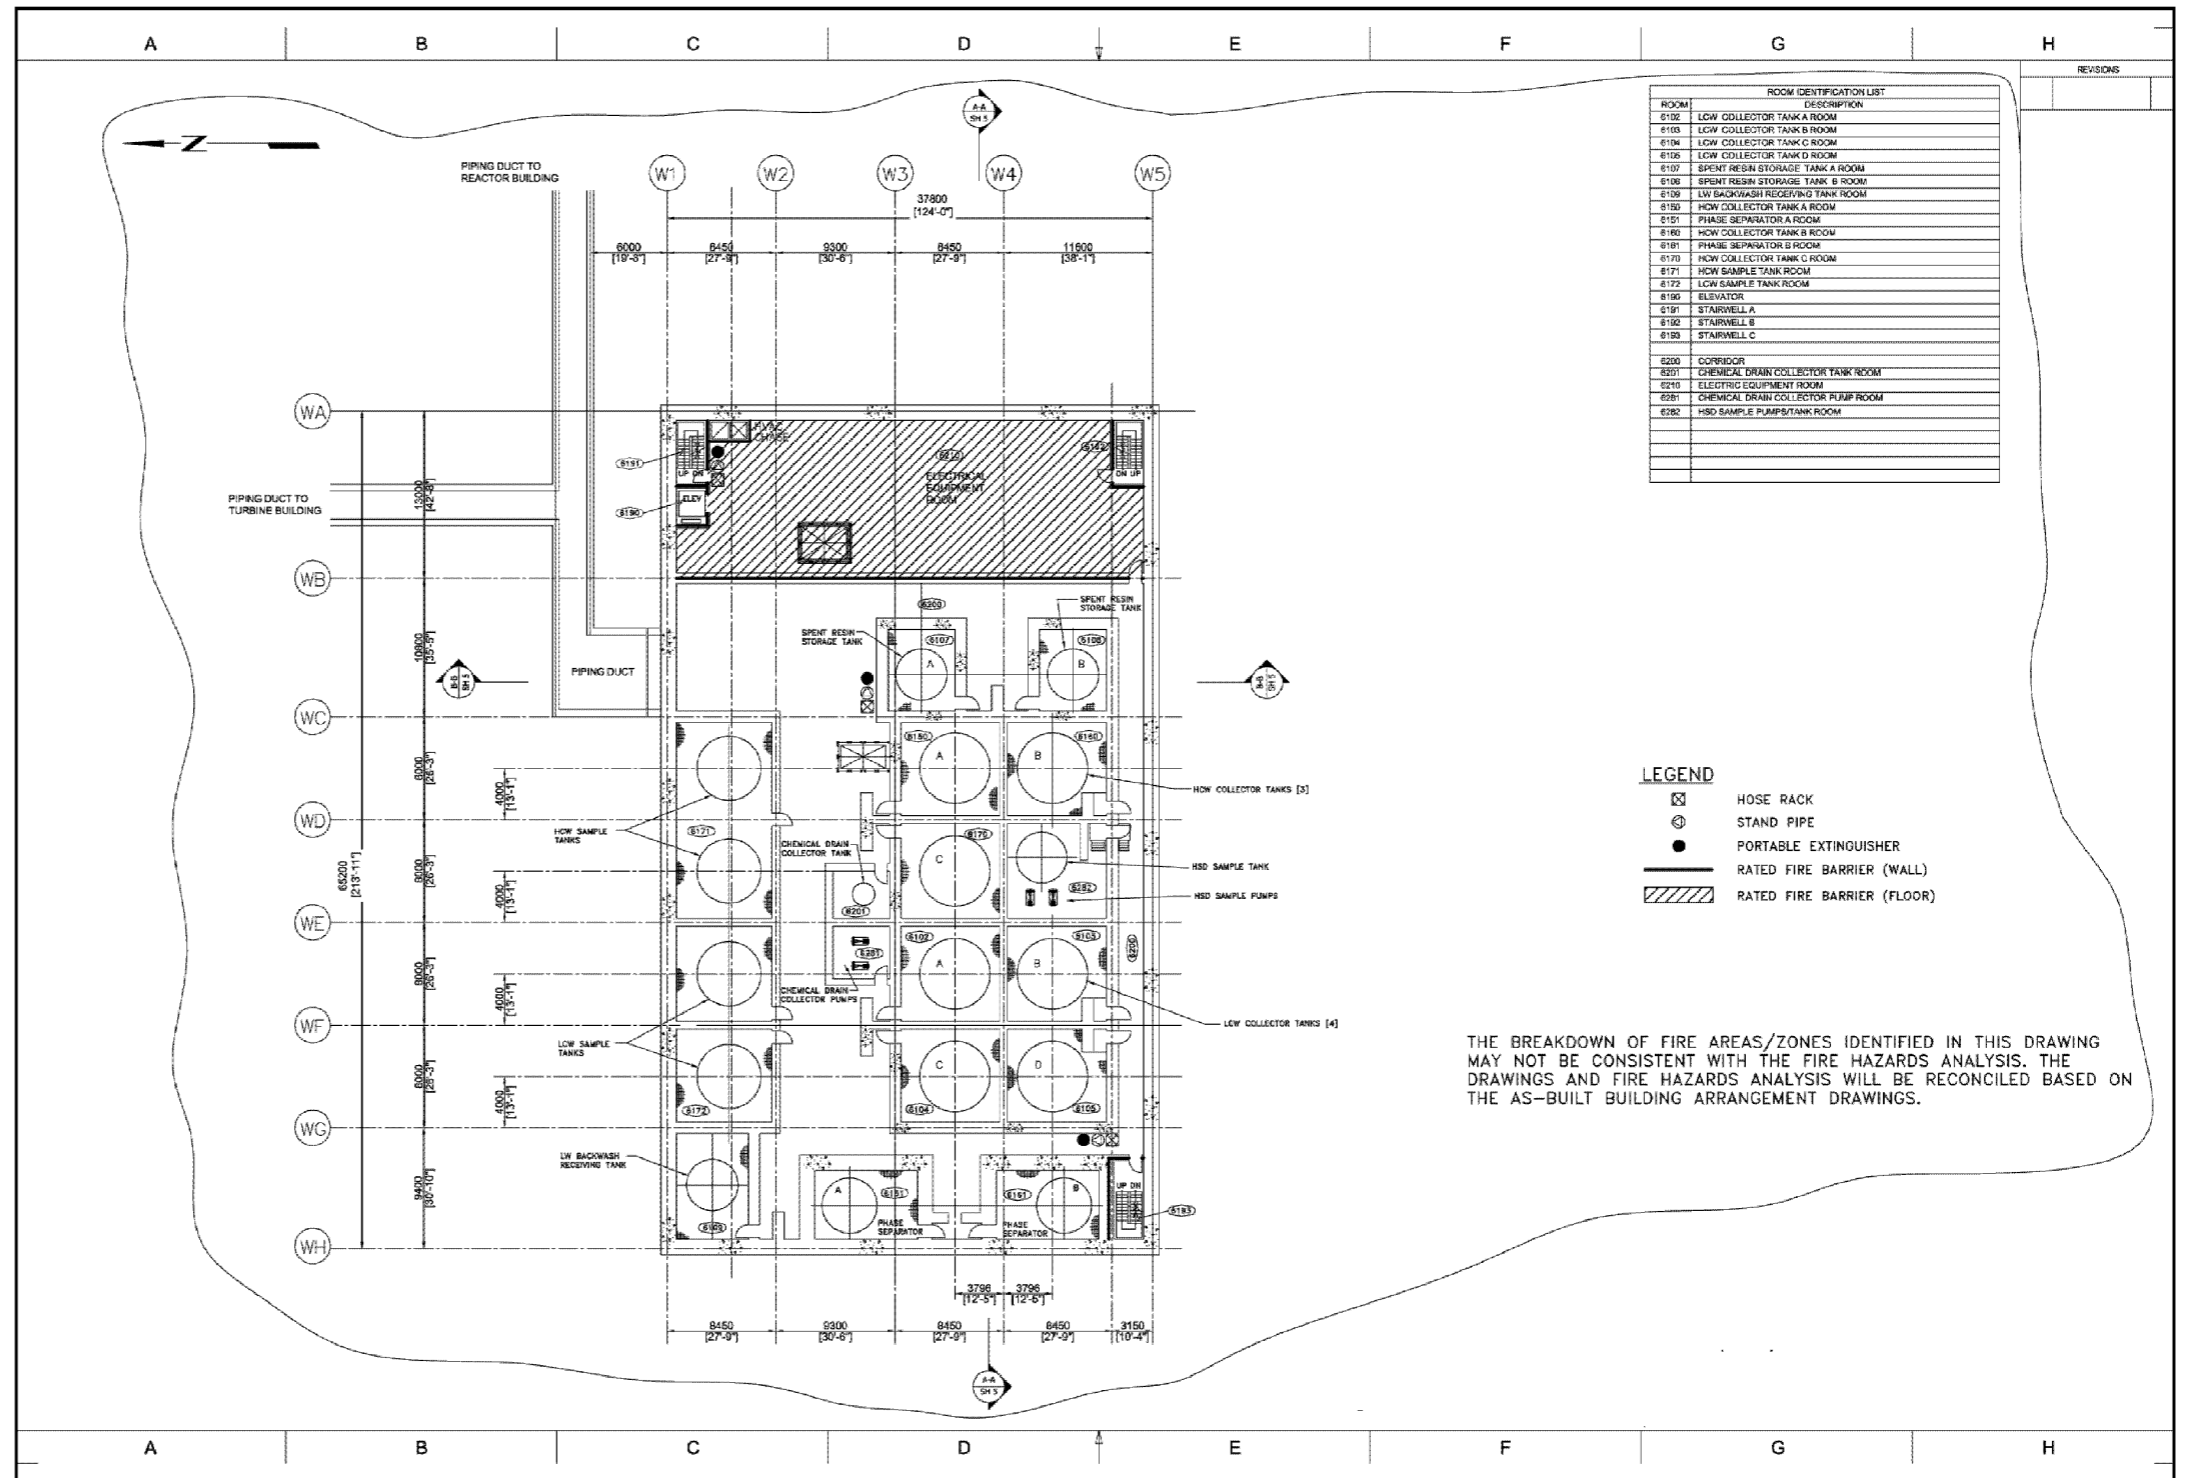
A.4-30 RADWASTE BUILDING FIRE PROTECTION AT ELEVATION 4800 mm
